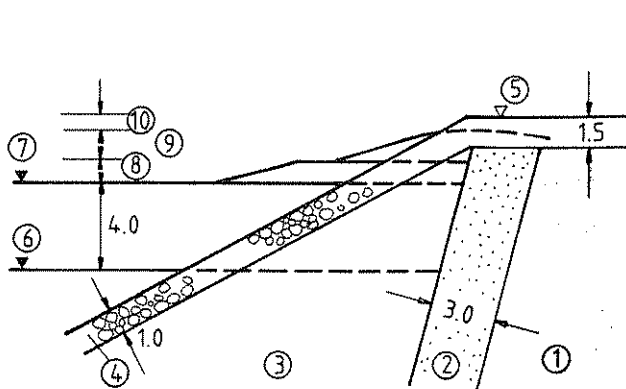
Rockfill dam with vertical earth core. Development of the freeboard (dimensions in m).
